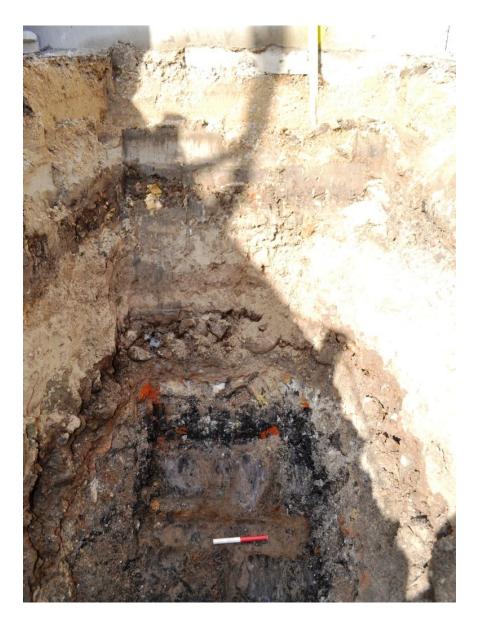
Section in pit for crane foundation at Reventlowsgade showing the cobble stone layer (blue arrow) and the sett paving with the drainage gully (yellow arrow).
